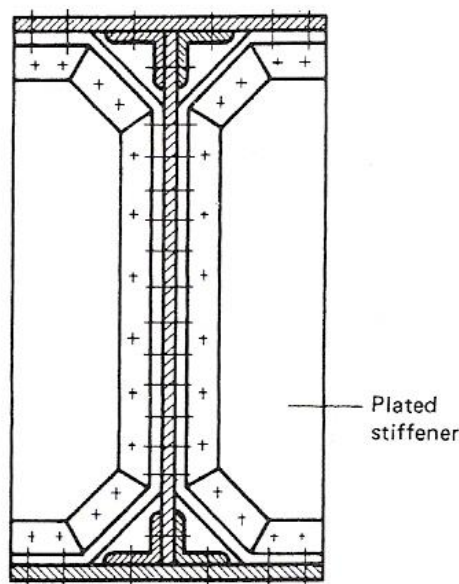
Riveted or H.S.F.G. Bolted Beam
